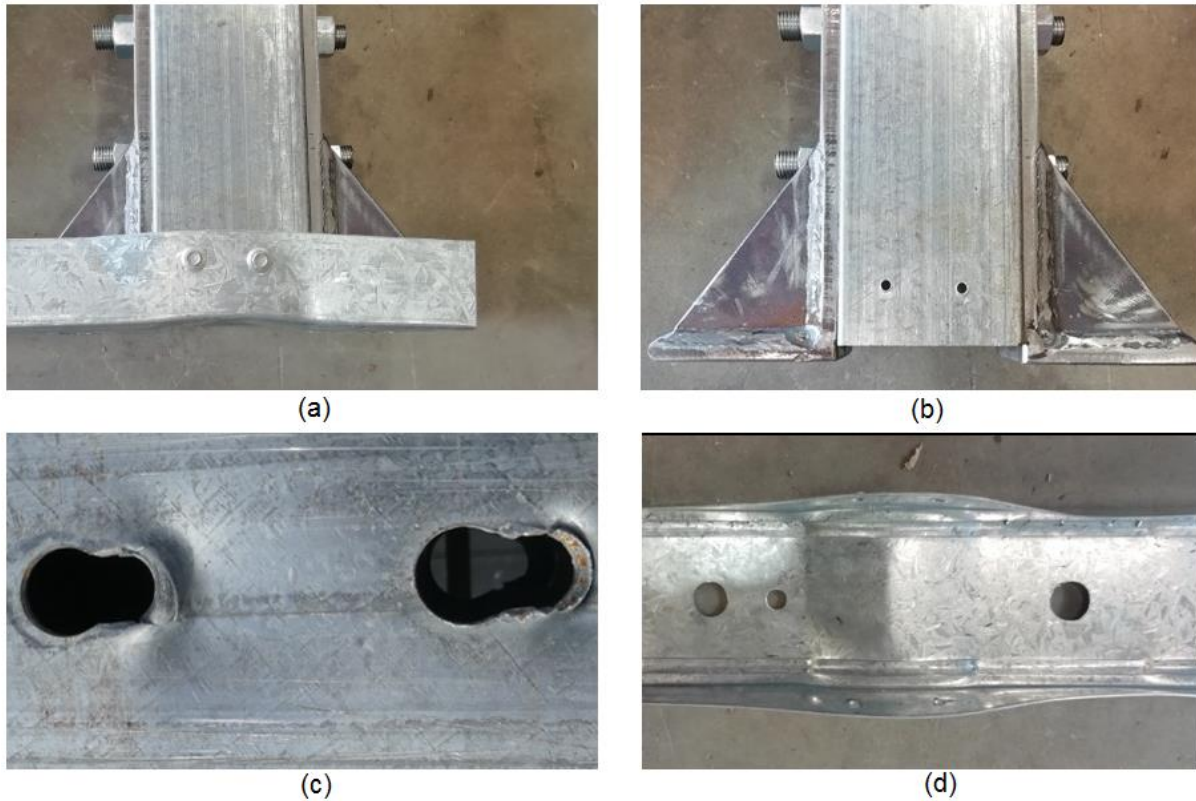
Failure modes of specimen HW2-Push: a) Deformation of track b) Sliding of SHS element c) Failure at the location of holes d) Buckling in track
